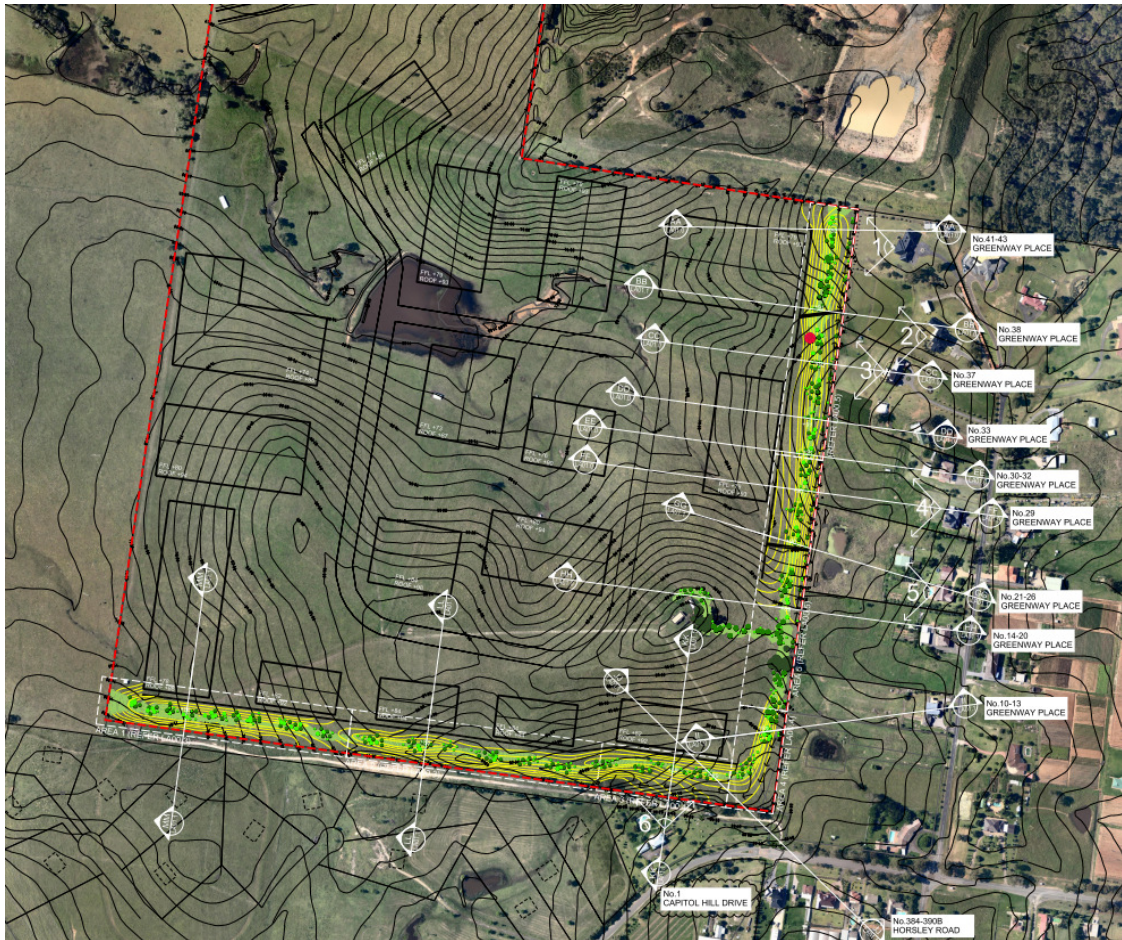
Proposed Site Layout Showing Surrounding Residences & Noise Measurement Locations
